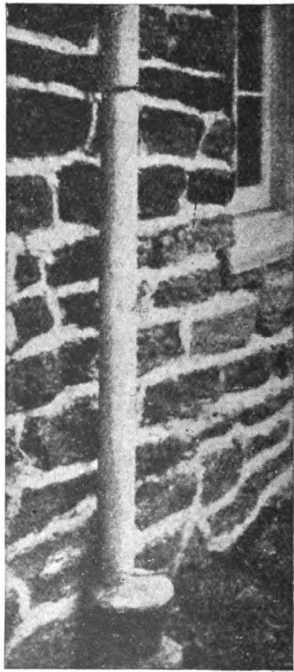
Hooks Fasten Leaders to Masonry and Connection to Sewer
